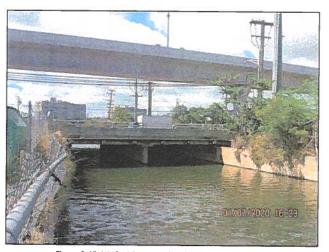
Wailani Drainage Canal – Farrington Highway
